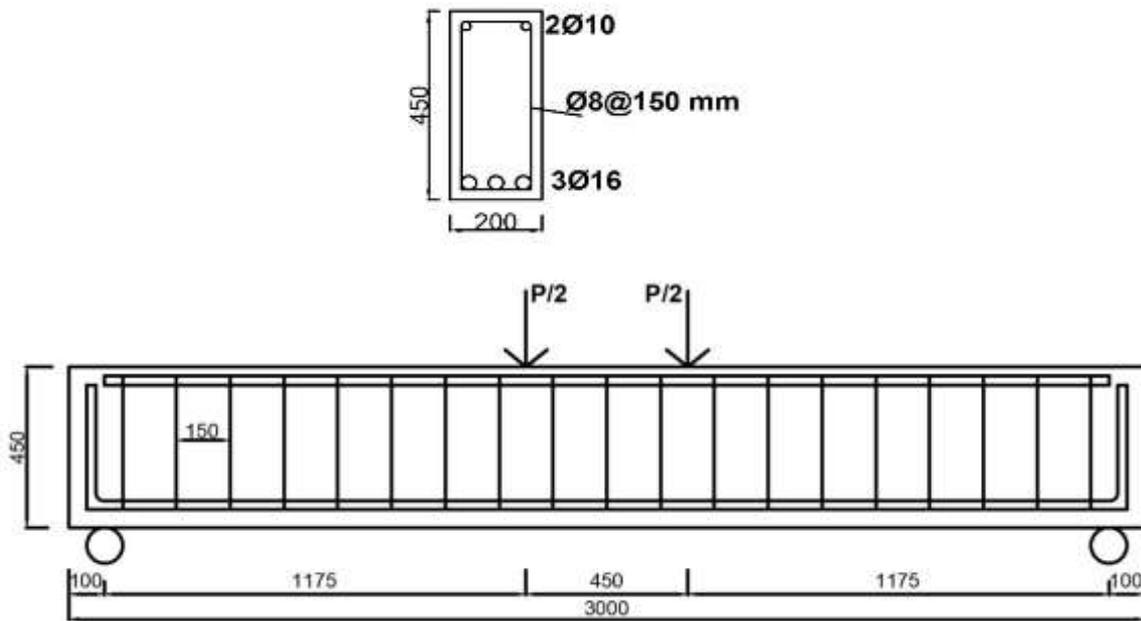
Details of RC beam tested by Elsanadedy et al. [10] (all dimensions in millimeters)
